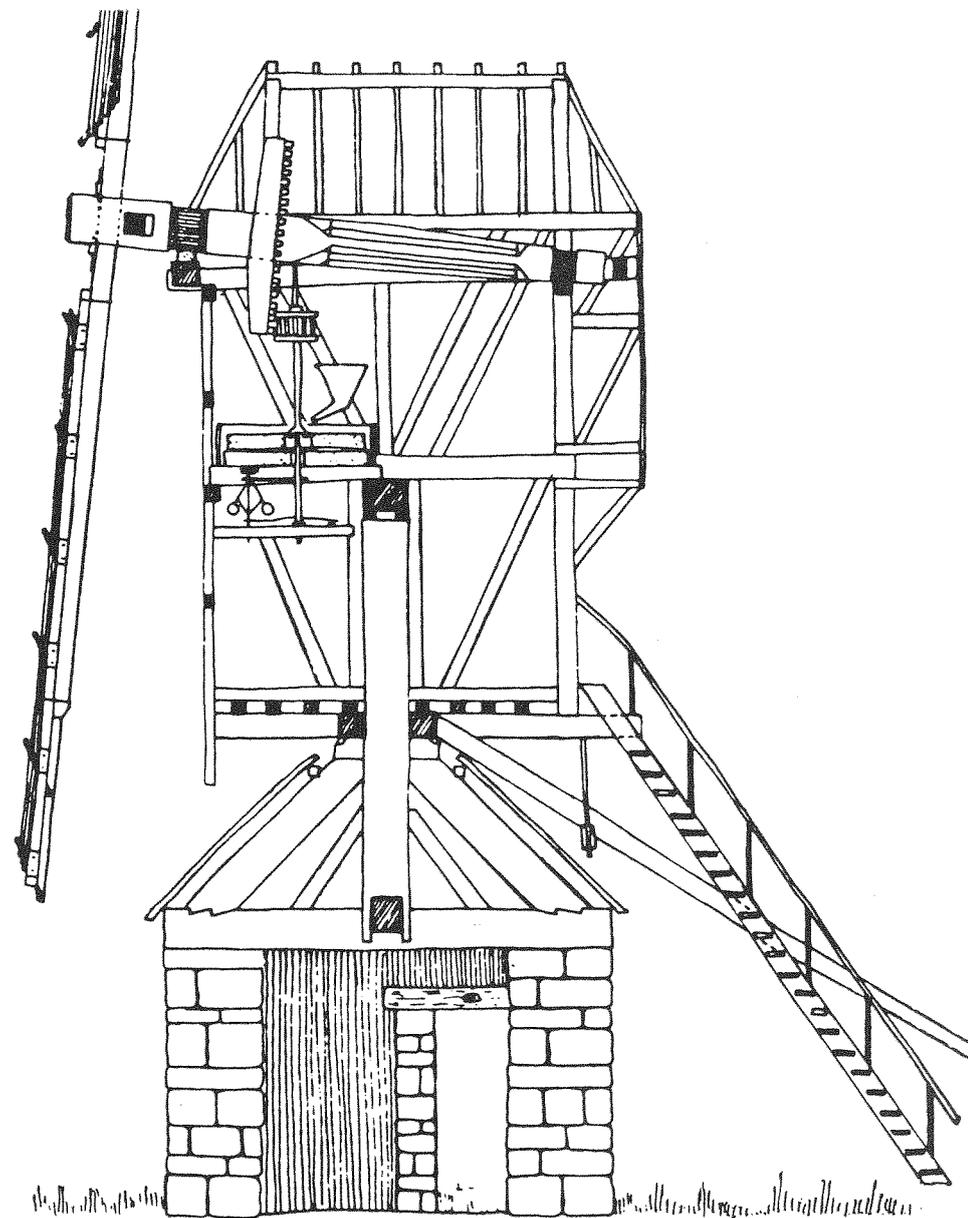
Sectional drawing of a Chandelier type mill (post mill).
